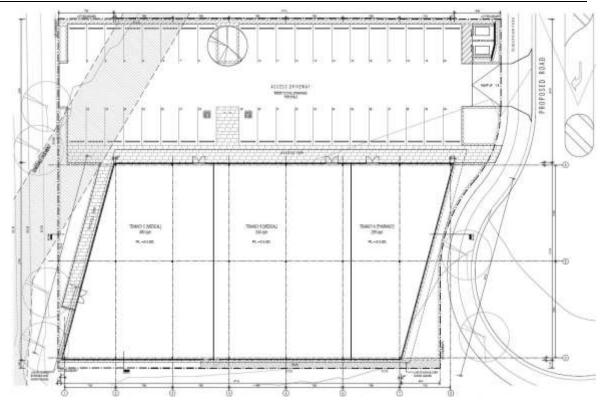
Ground Floor Plan (Source: Turco & Associates)
